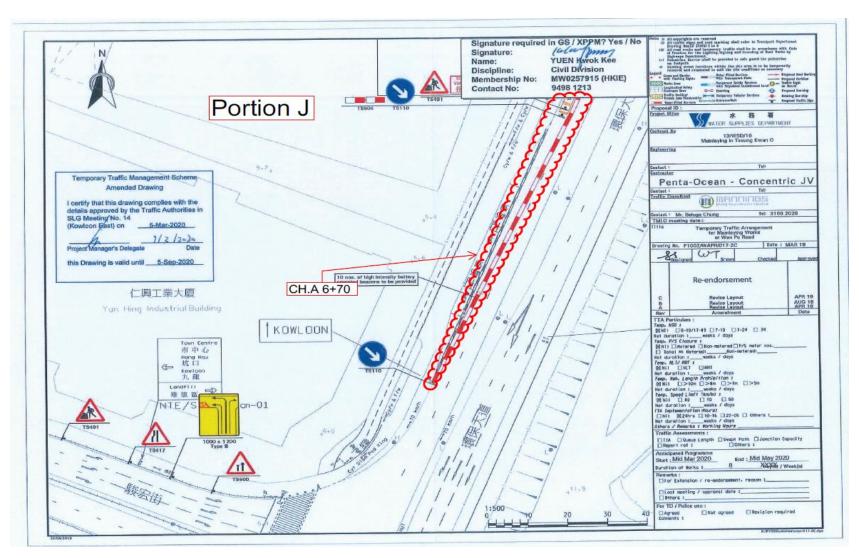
(ii). Location Plan for Portion J - CH.A 6+70
